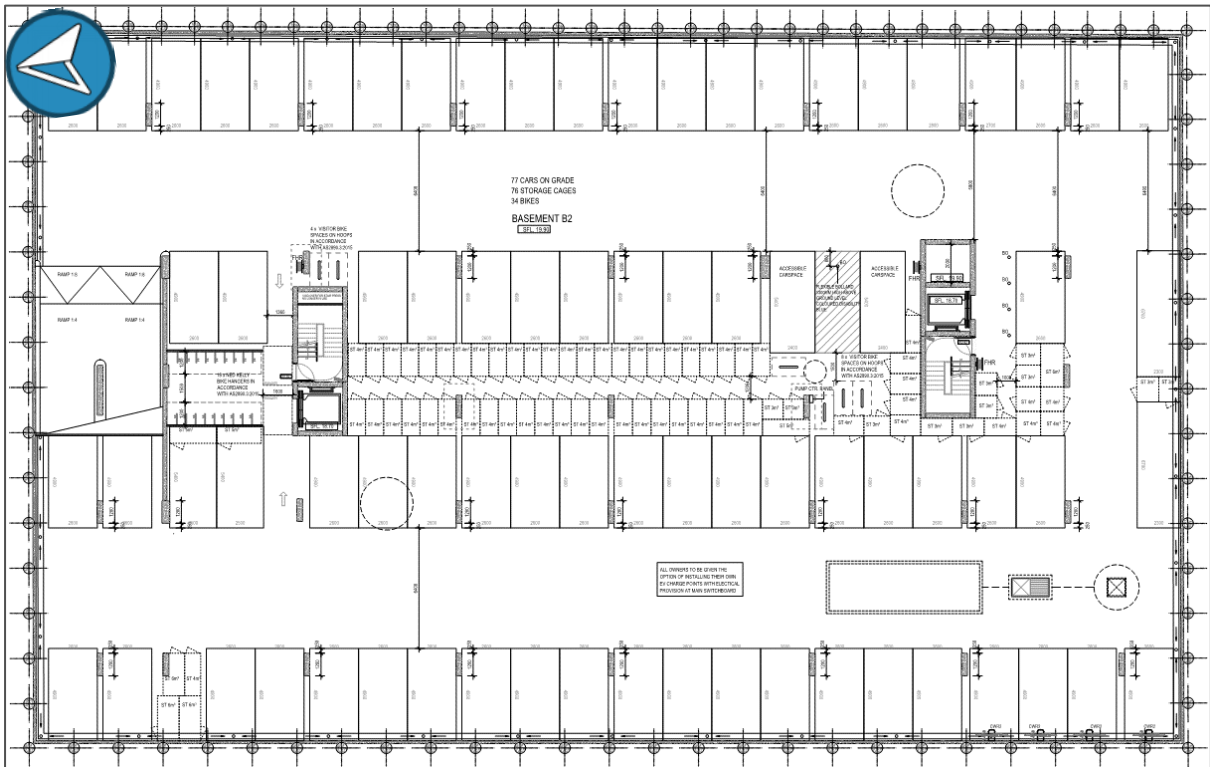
Proposed Floor Plans – Basement 2 (Image Source: Artisan Architects)
